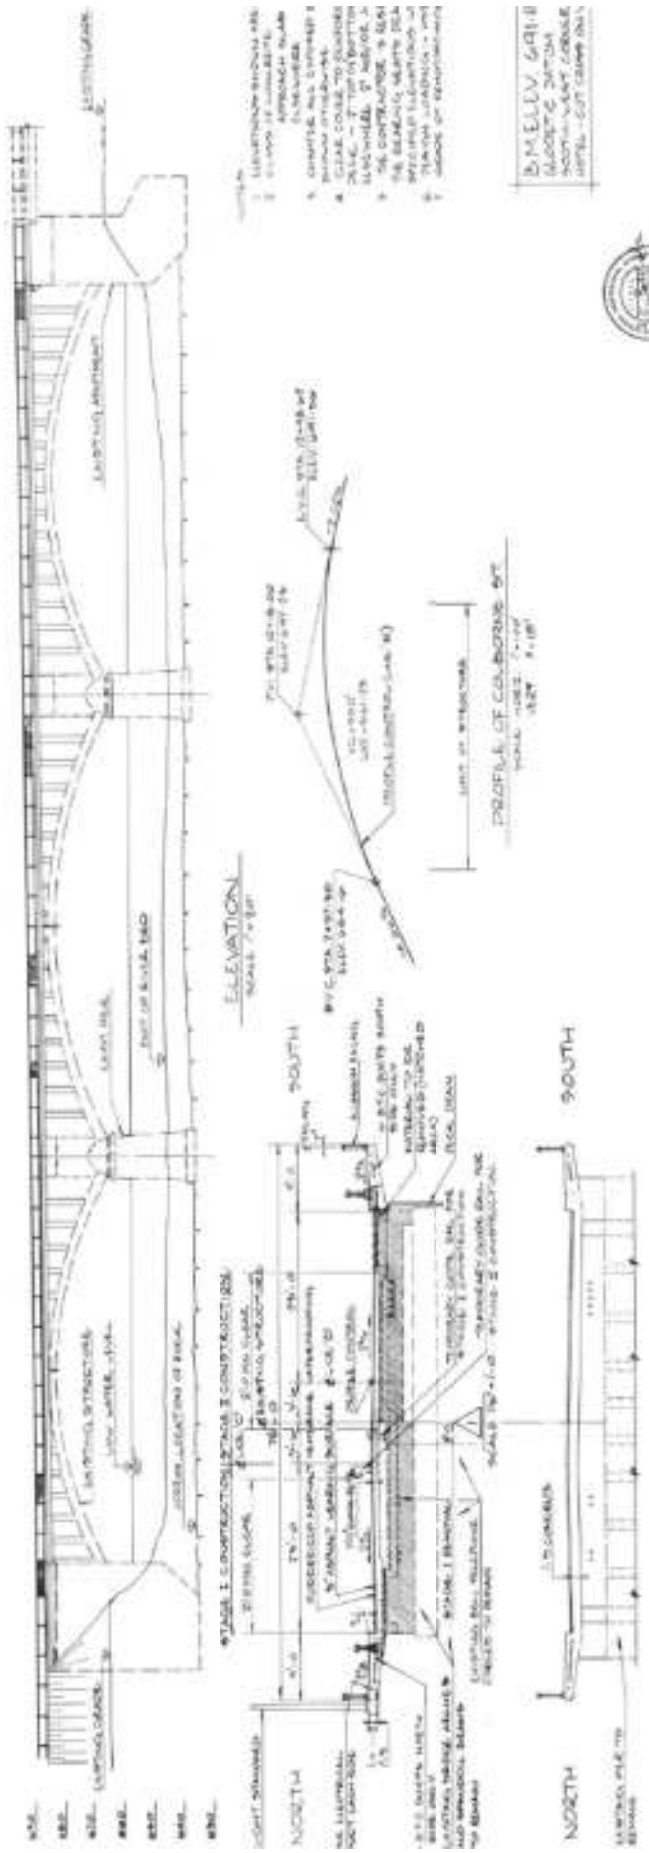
Sections and elevation from the 1980 reconstruction (J.D. Lee Engineering Ltd. 1980)
